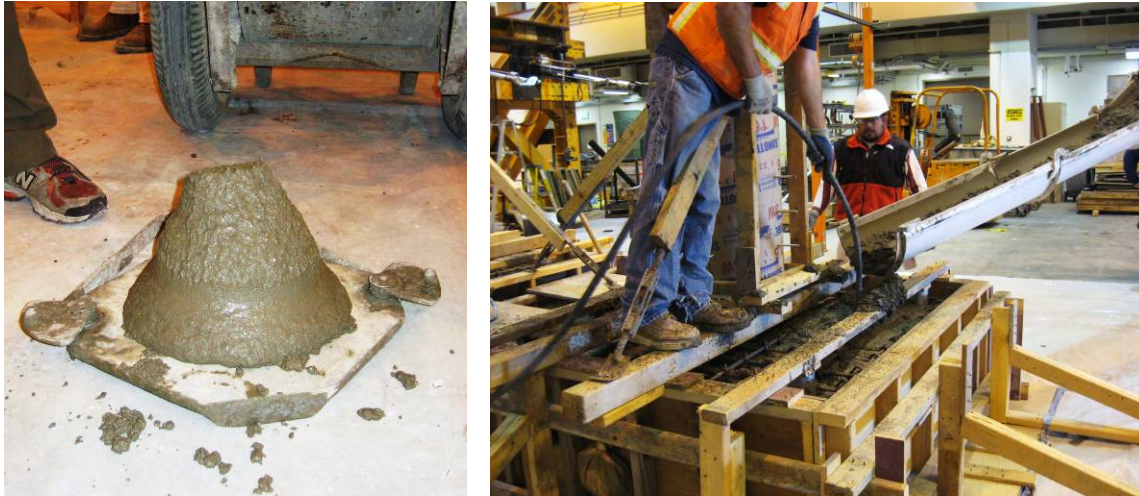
(a) Slump test of plain concrete mix; (b) Casting of anchor blocks
